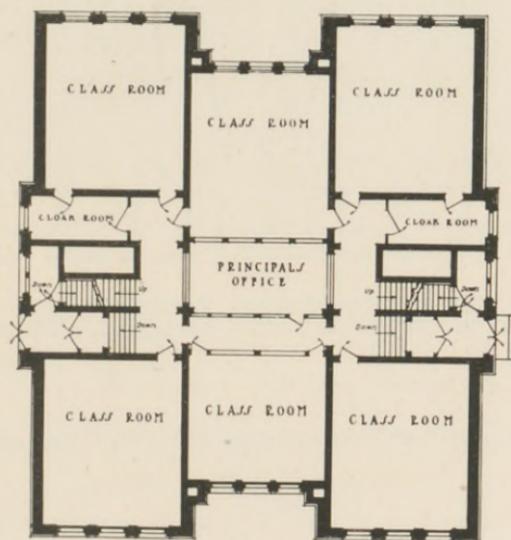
Types of school buildings, Philadelphia. Plan of type of 1870.
